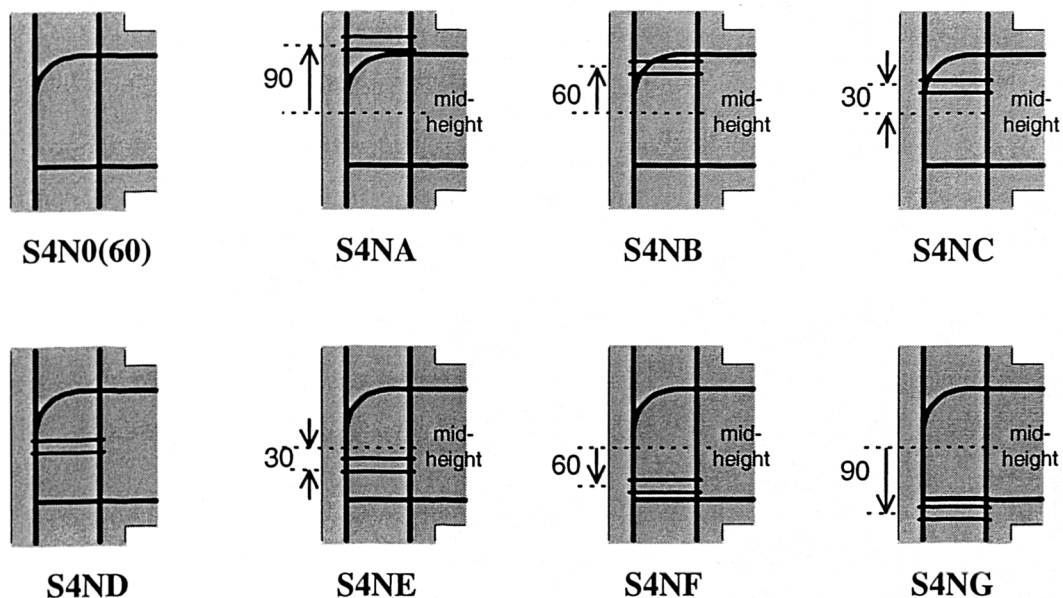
Joint tie positioning (dimensions in mm)
